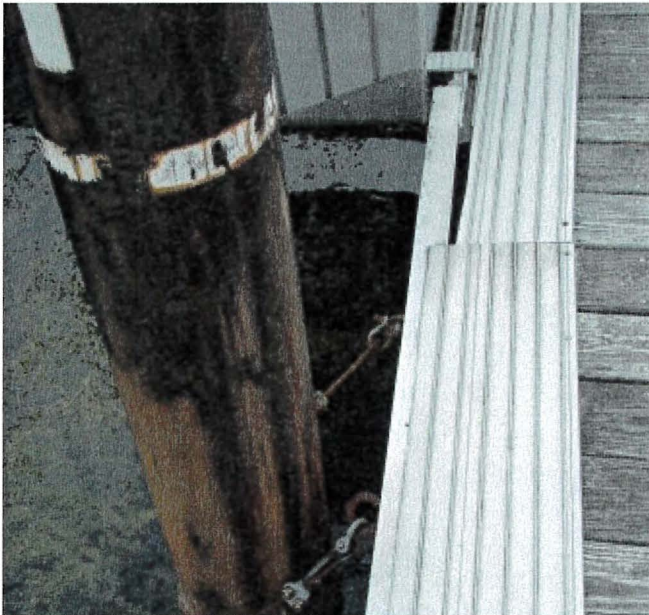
West Main – Dock A. Deck Timber Minor Splintering by Slip 11
